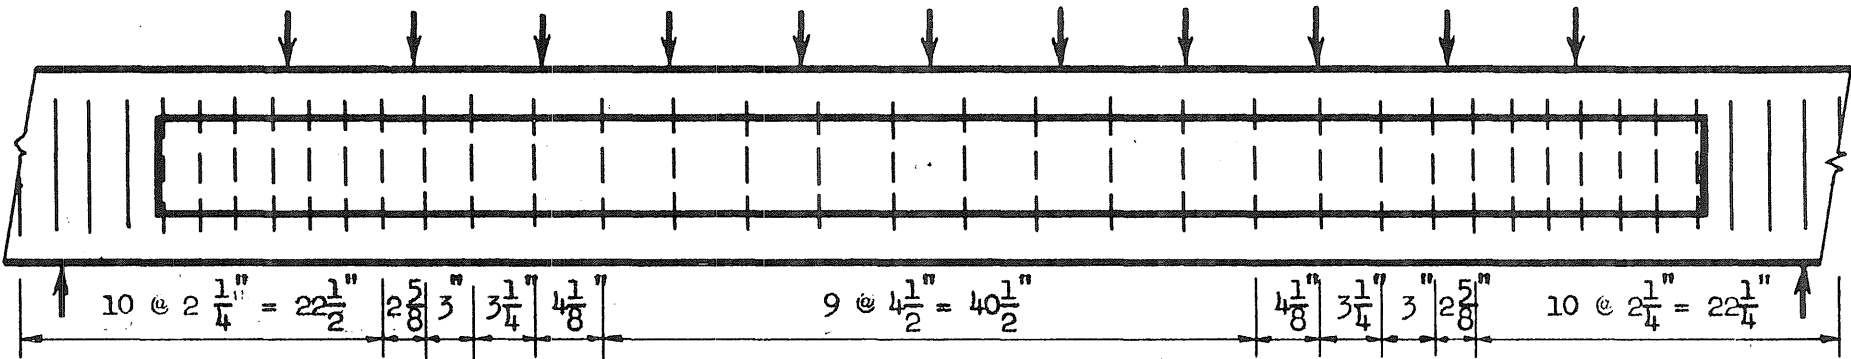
STIRRUP ARRANGEMENT 14 - BEAM CW.28.26
